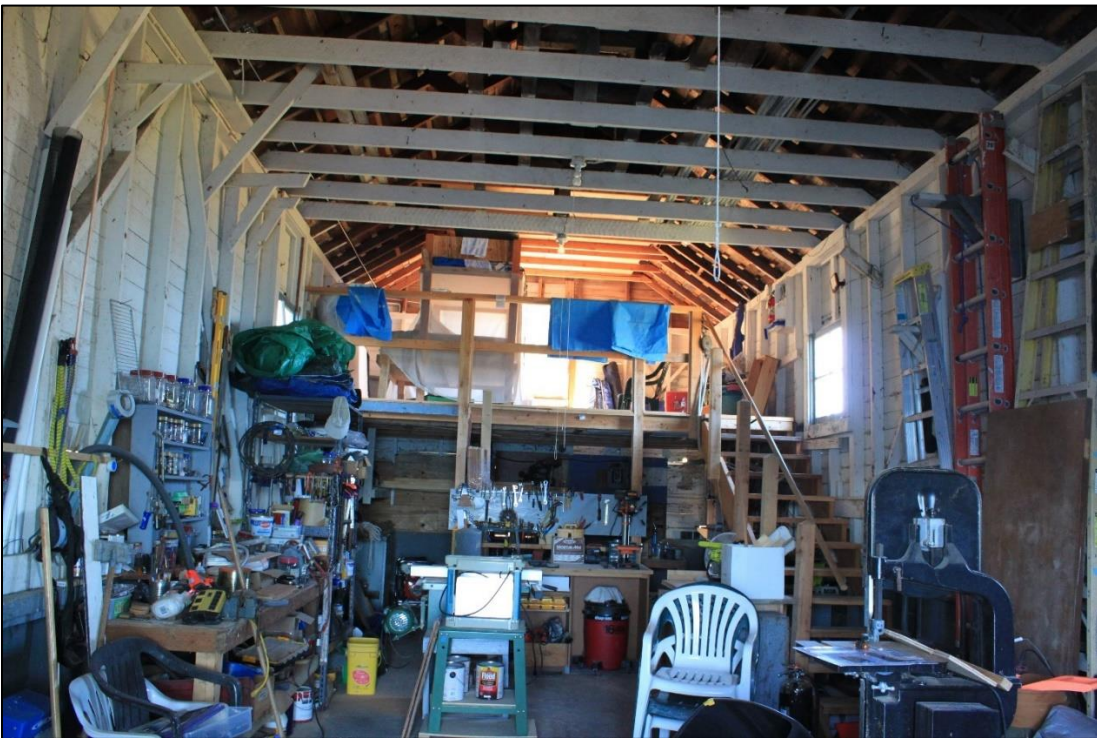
of 46: Boathouse interior facing north wall and showing landing.
